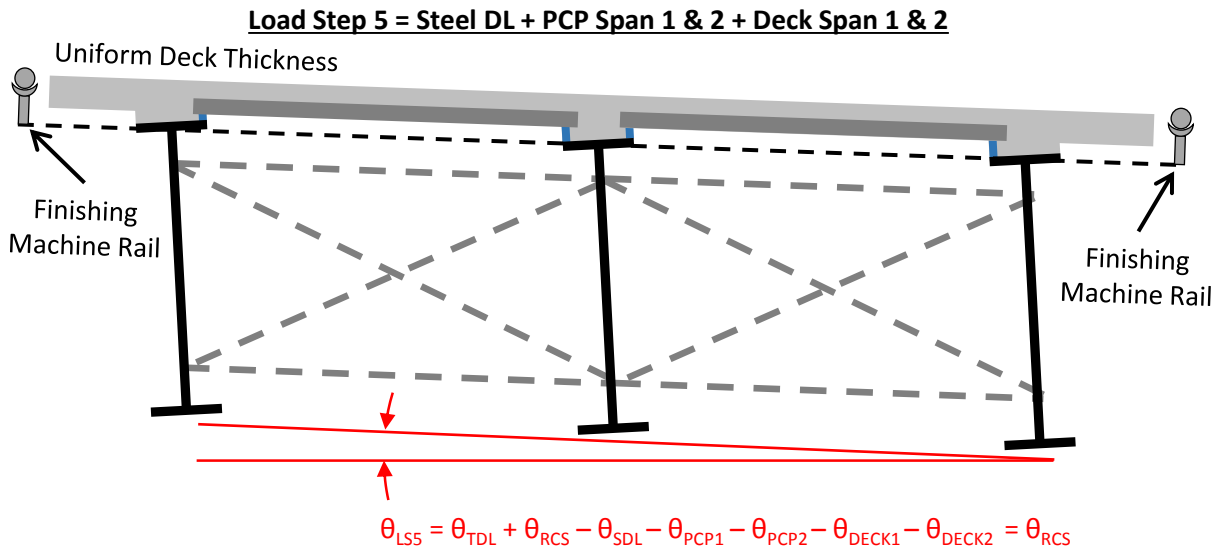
Load Step 5– Steel I-Girder System Twist SDF – Section A-A
